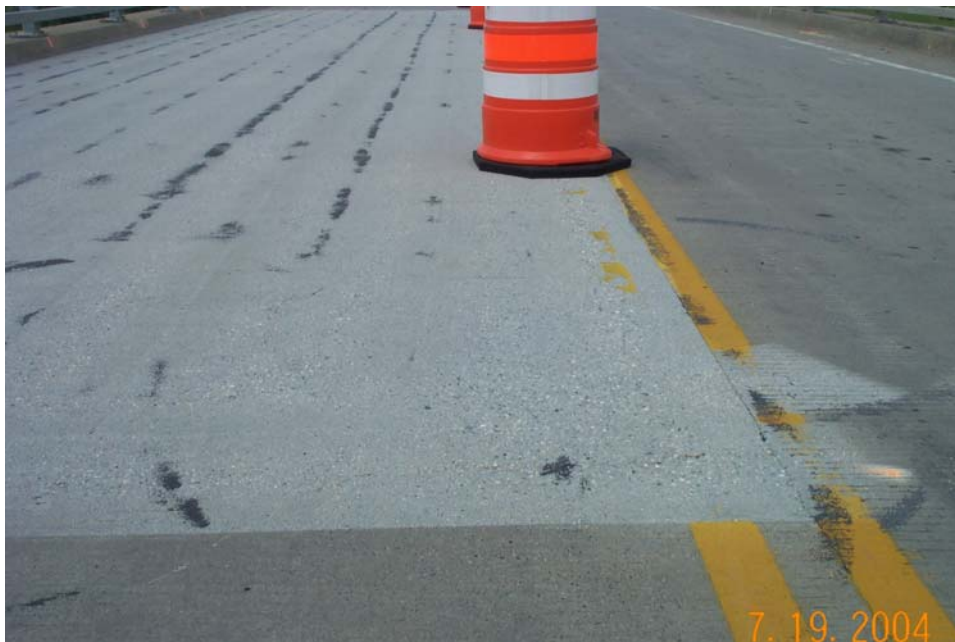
Difference between sandblasted and non-sandblasted portion of the deck.
